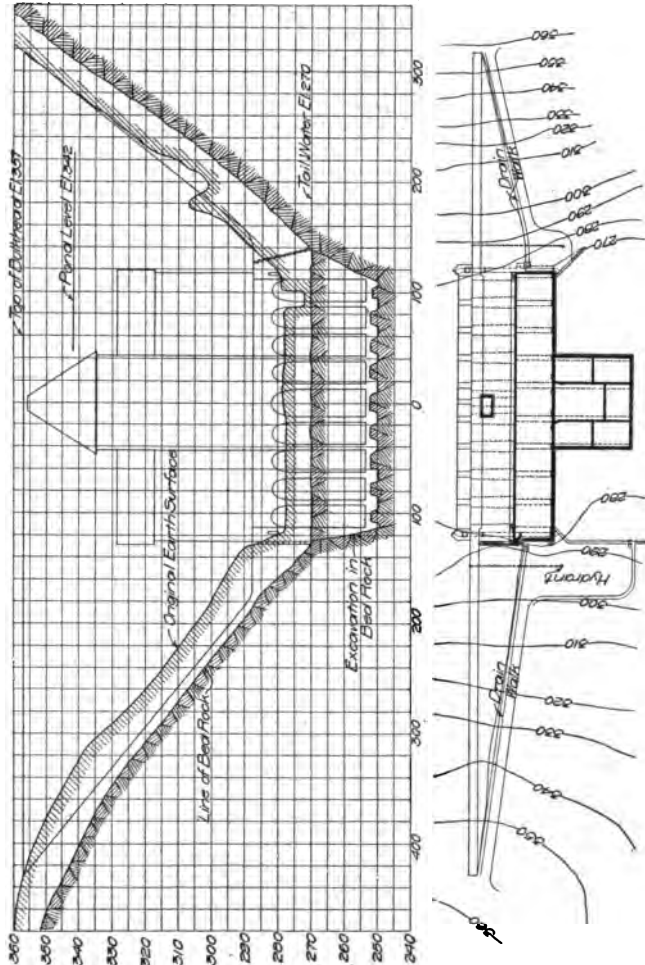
PLAN AND ELEVATION OF POWER-HOUSE.
